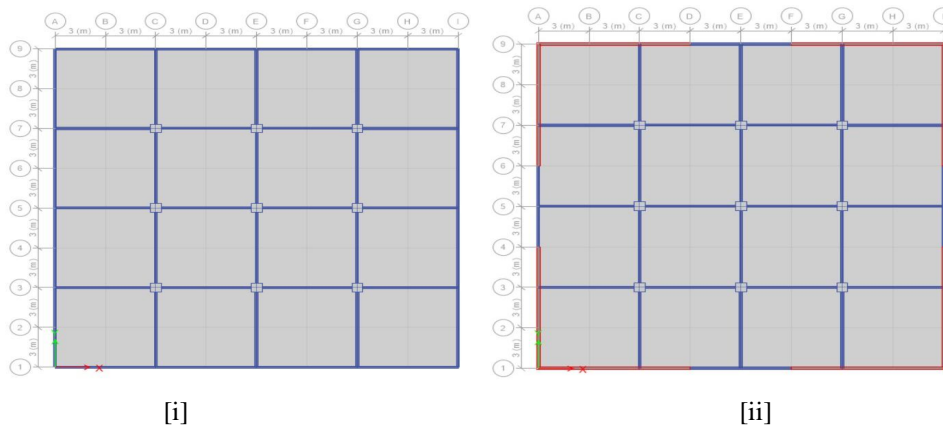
plan of [i] diagrid building [ii] shear wall building
